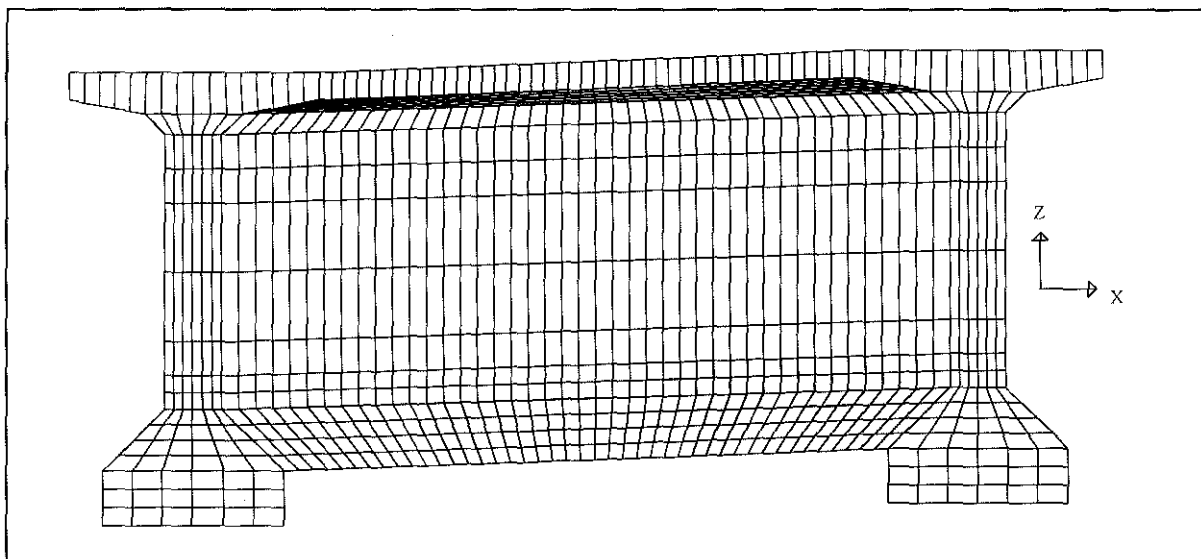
Cross Section of Diaphragm-Girder Finite Element Model.
